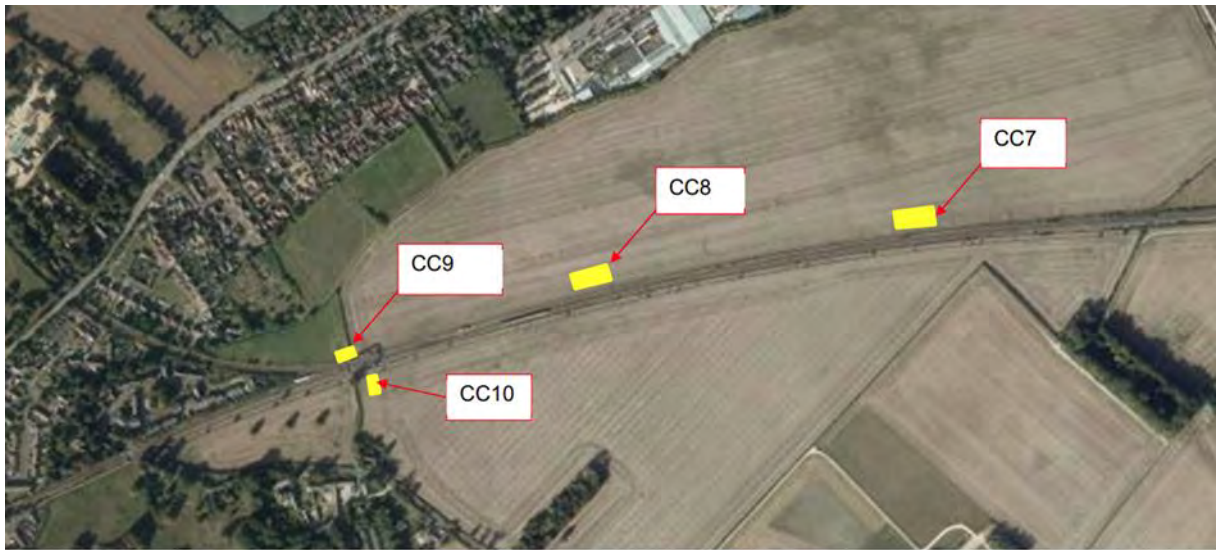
Proposed Construction Compounds, Shepreth Branch Junction Area
